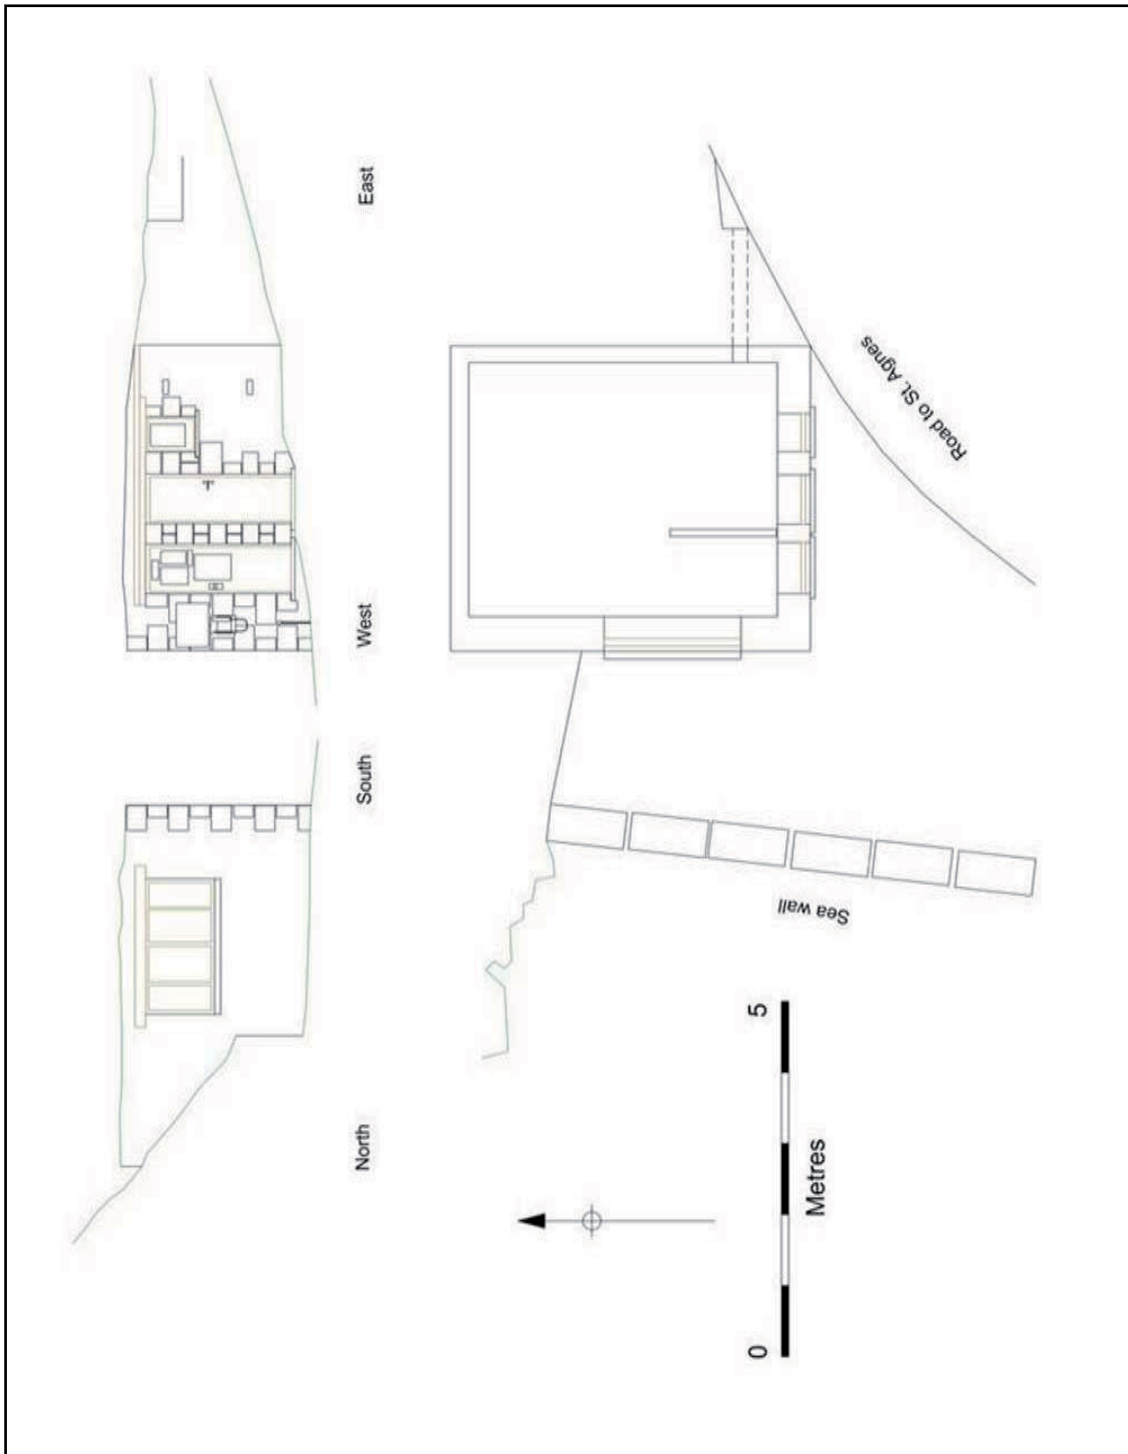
Plan and external elevations of lifeguard/ car parker bunker at Chapel Porth [190488].
